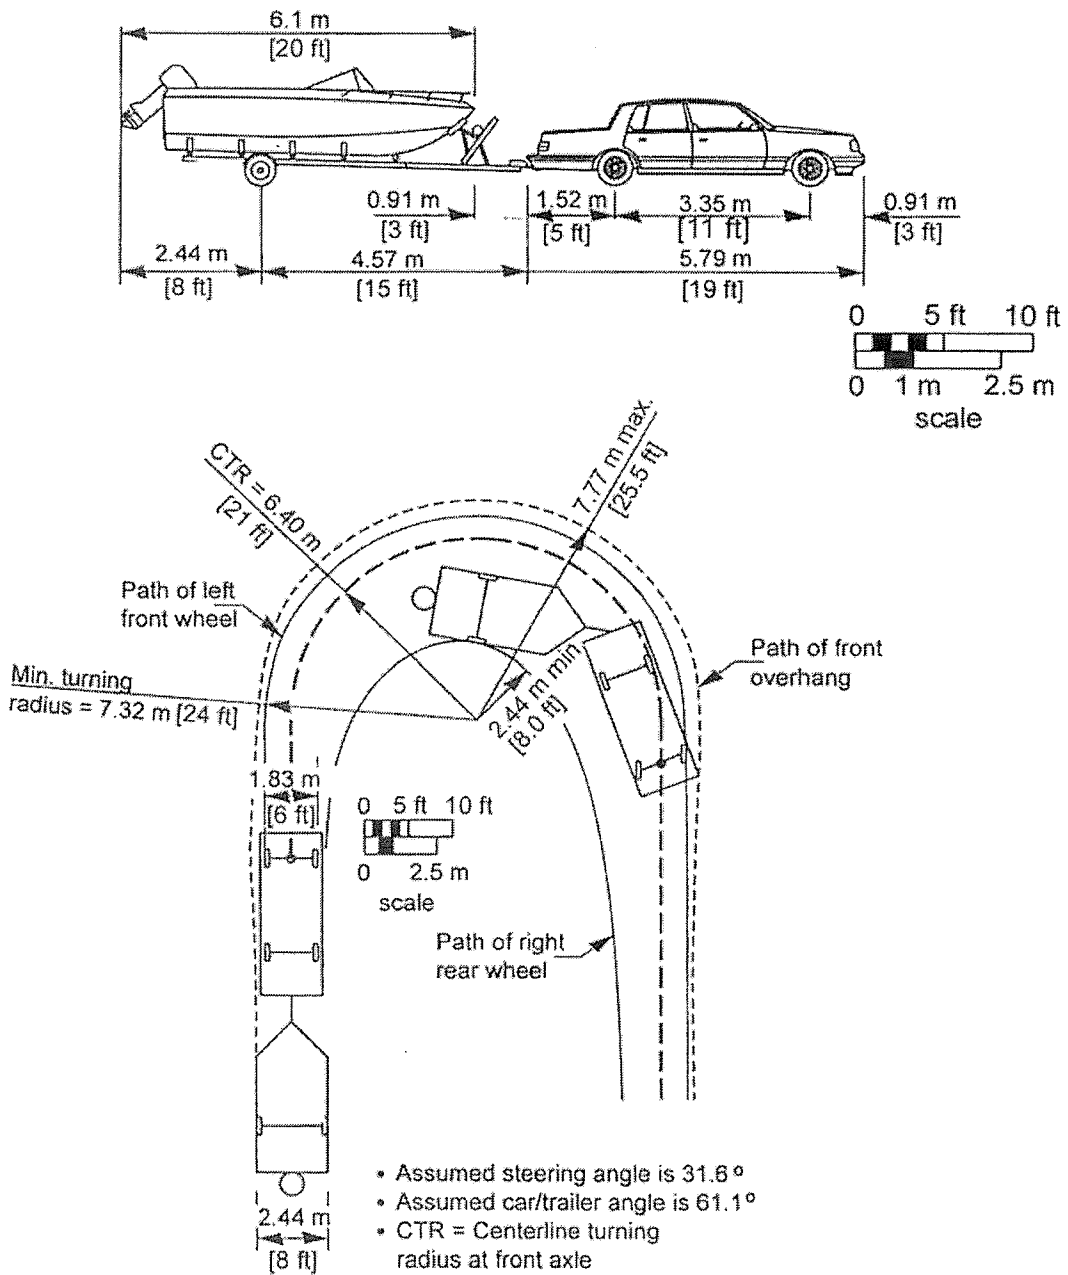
Minimum Turning Path for Passenger Car and Boat Trailer (P/B) Design Vehicle
